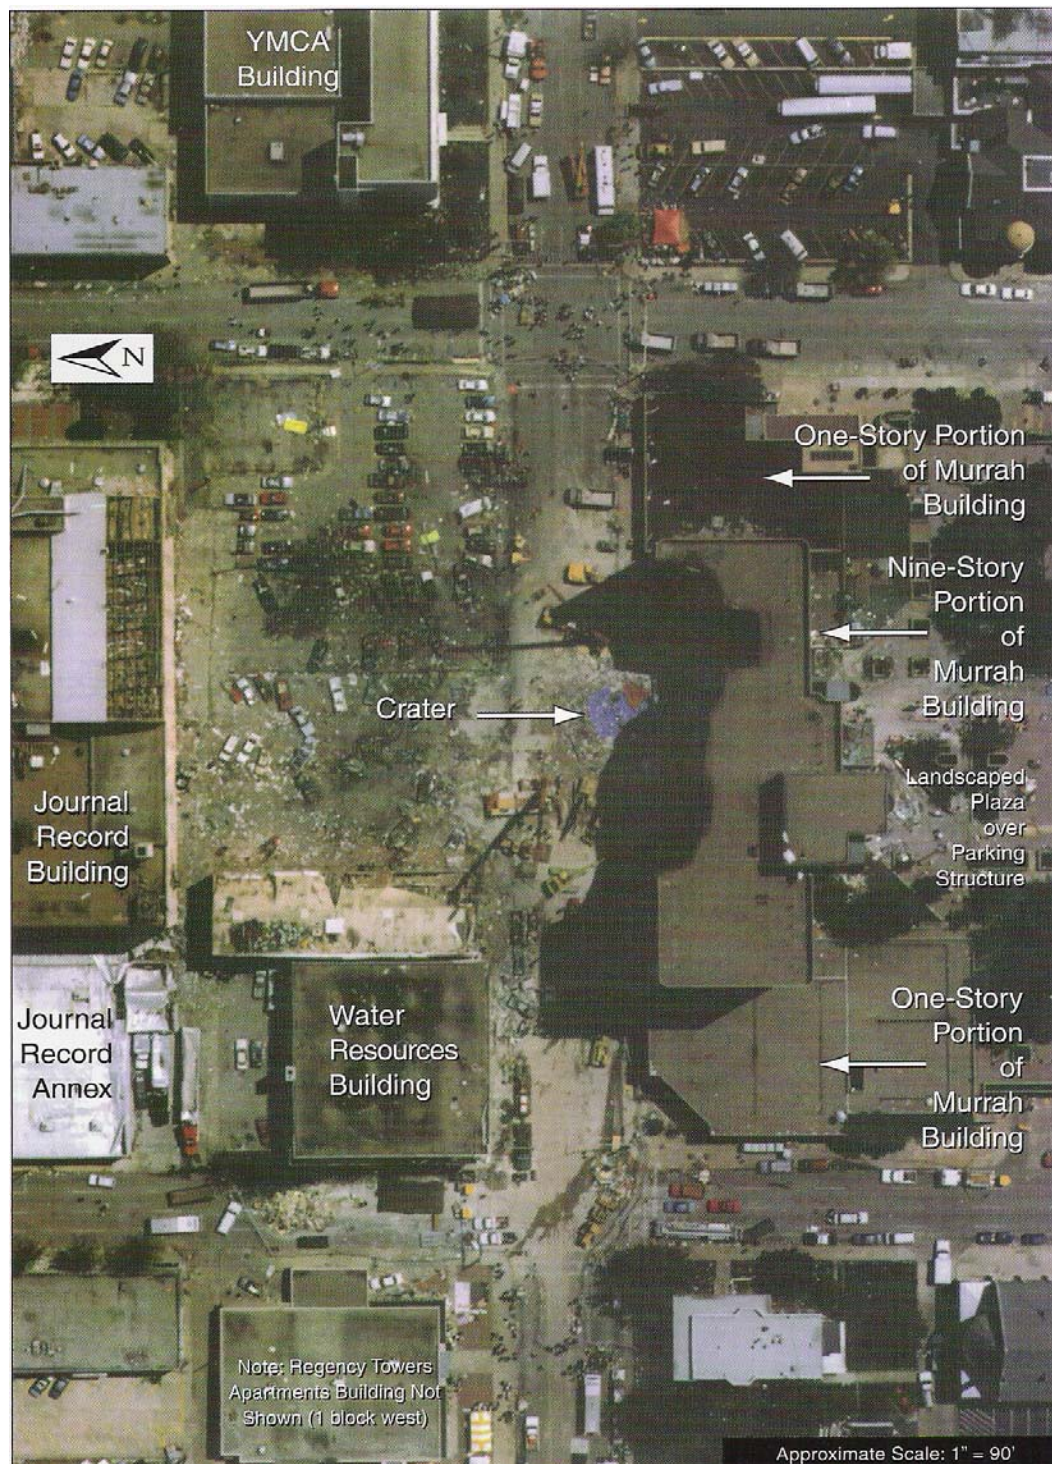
Aerial View Of Damaged Structures (FEMA 1996)
